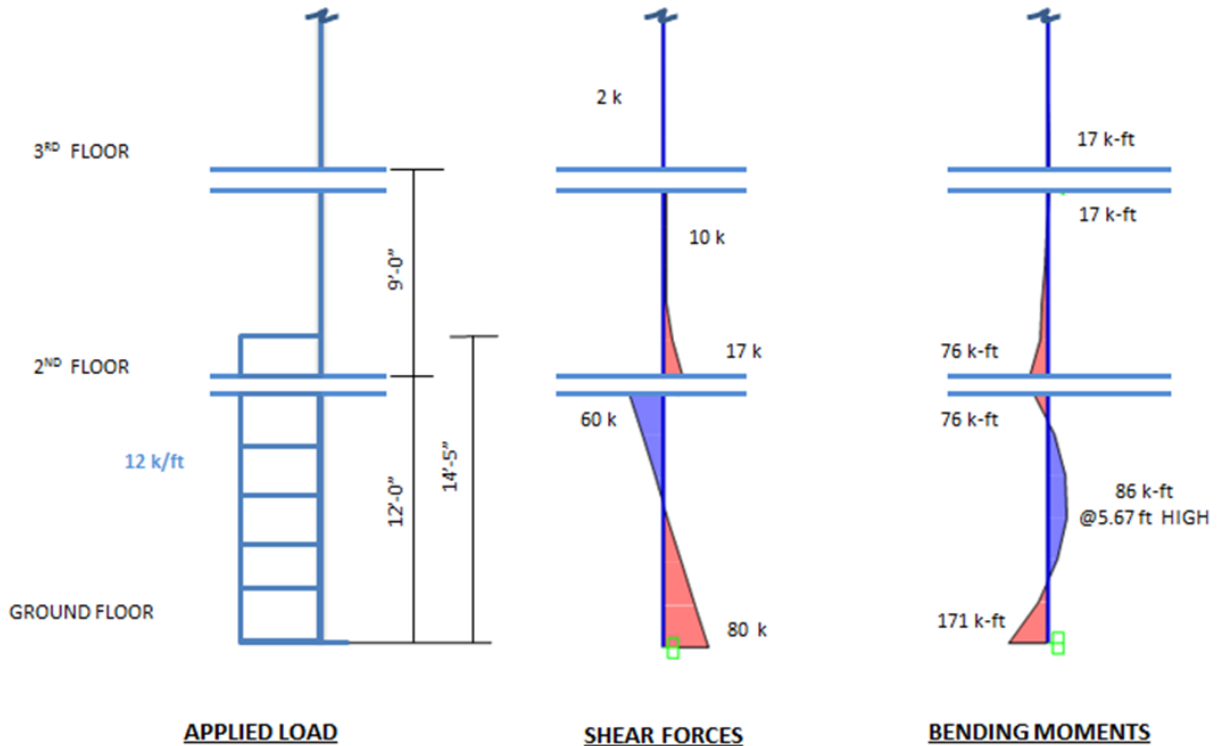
Hydrodynamic loading on exterior wall of Monterey residential building due to Load Case 2
